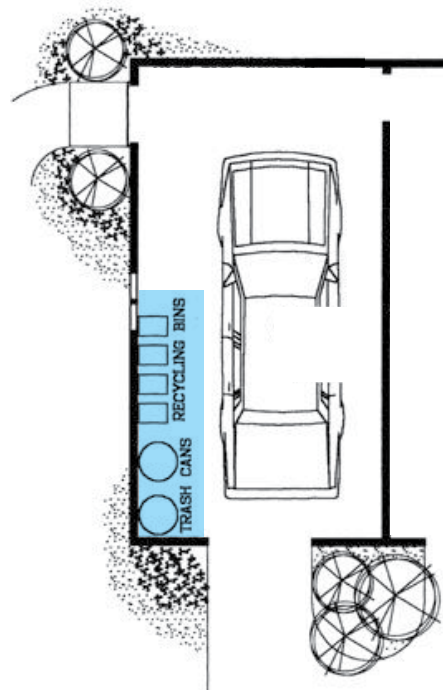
Garage layout sample illustration, showing space for bin storage
